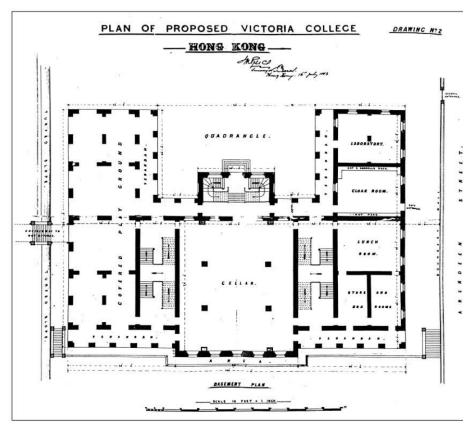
Basement plan of Victoria College (renamed as Queen's College in 1894) in 1889.
